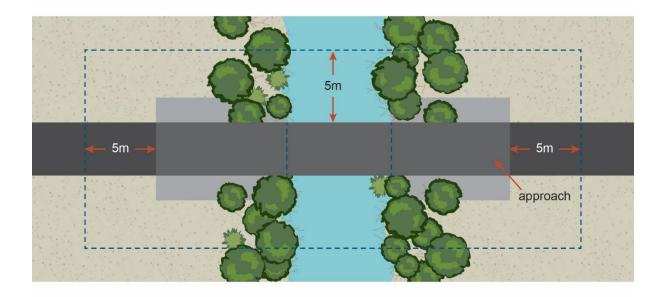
Public vehicle road bridge / culvert or public rail bridge
